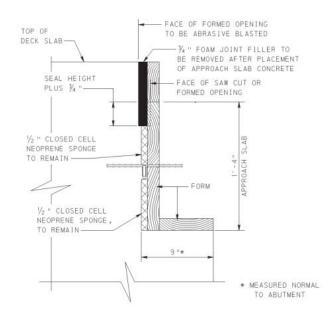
Waterproofing at expansion end (without approach slab in figure)
